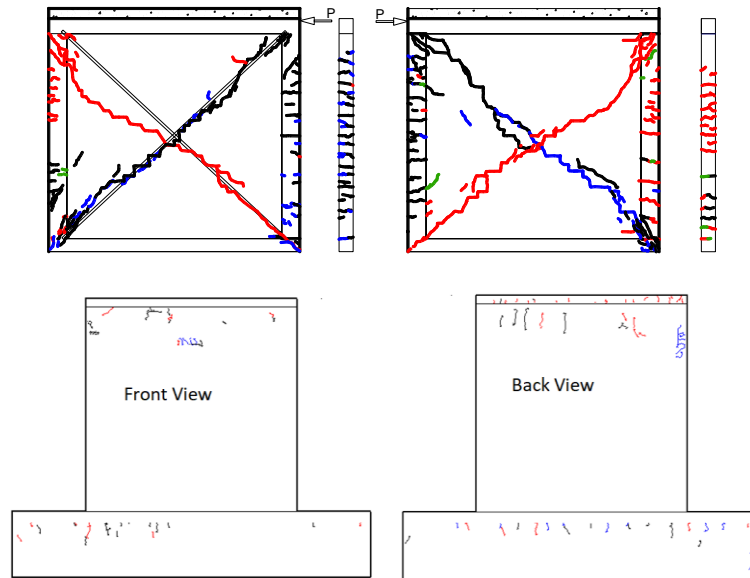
Cracking on the masonry wall (top) and on RC wall (bottom), after applying the complete load cycles. Cracking on the front side and back side of the wall are illustrated.
